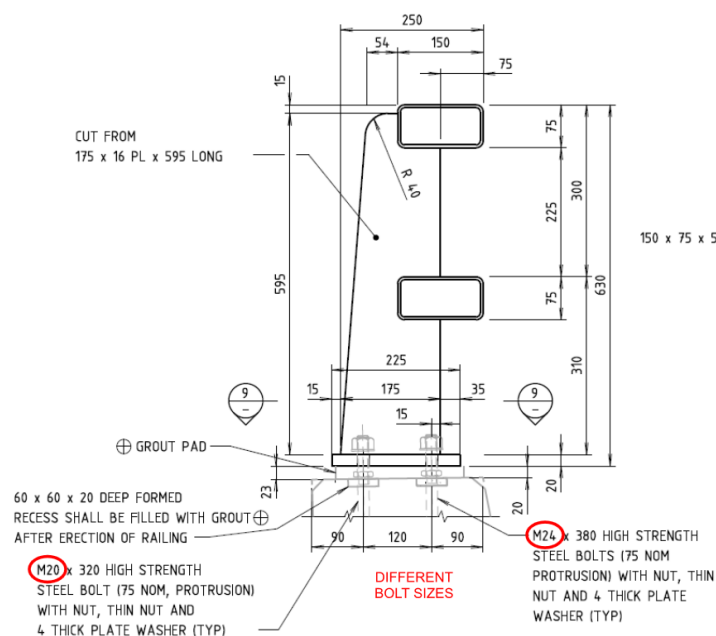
Traffic barrier arrangement (RMS [annotated], 2016)
